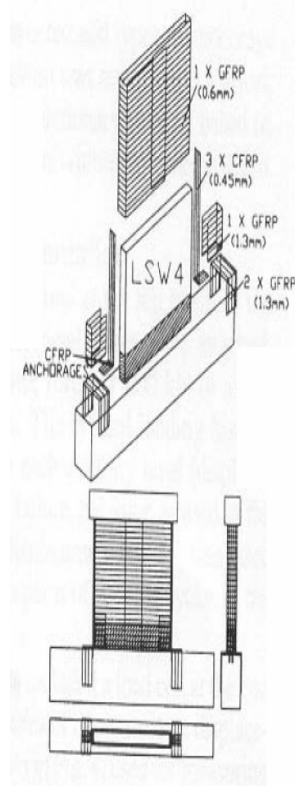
FRP rehabilitation and retrofit solution for a structural wall
